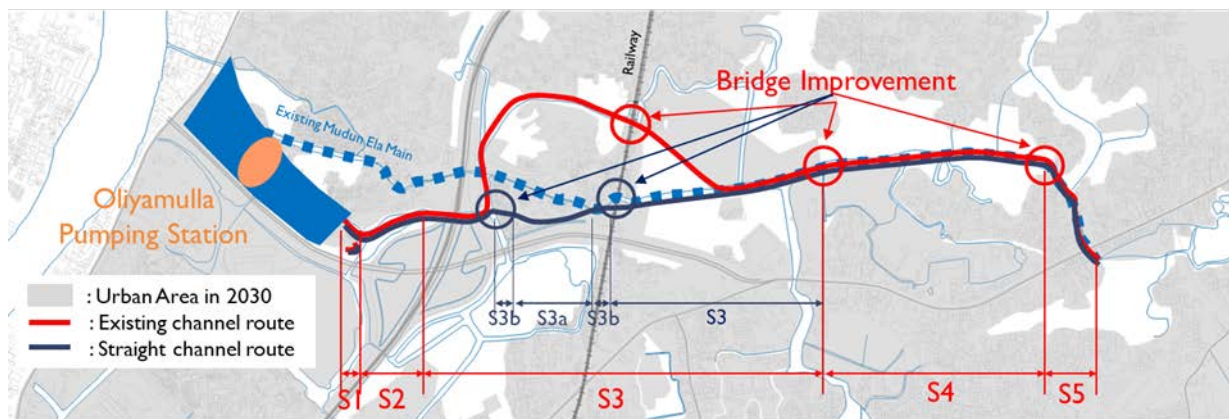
Planning Section (S1-S5) and Design Alignment
